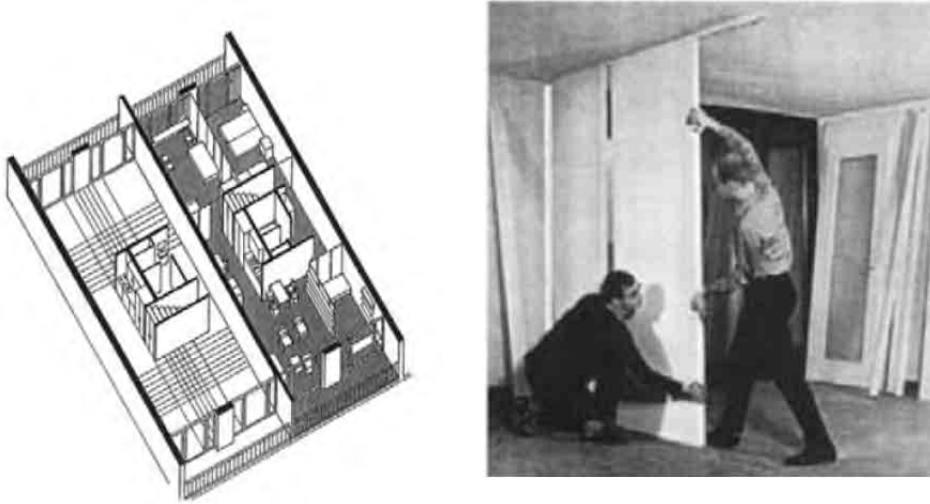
Building with various dwelling layouts, drawing of M & A Architects, 1994, Pipe-Stairwell Adaptable Housing ,Cuiwei Residential Quarter, Beijing, China – Ref: Stephen Kendall, Residential Open building
